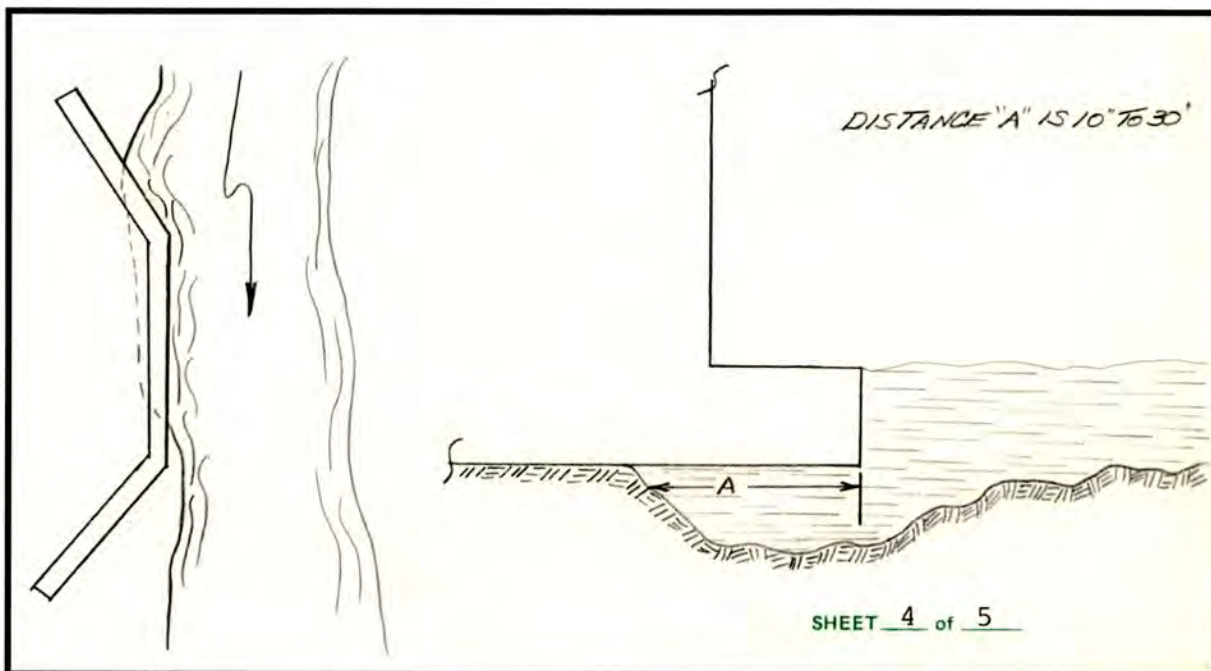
Plan view of the northern abutment on Courthouse Creek (left) and profile view (right) of base of same abutment illustrating the depth of void.
